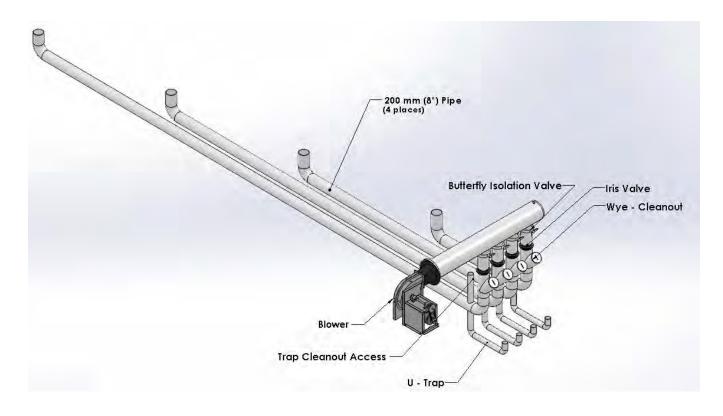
Typical Bay Aeration Piping Arrangement (as shown for 4 bays)
